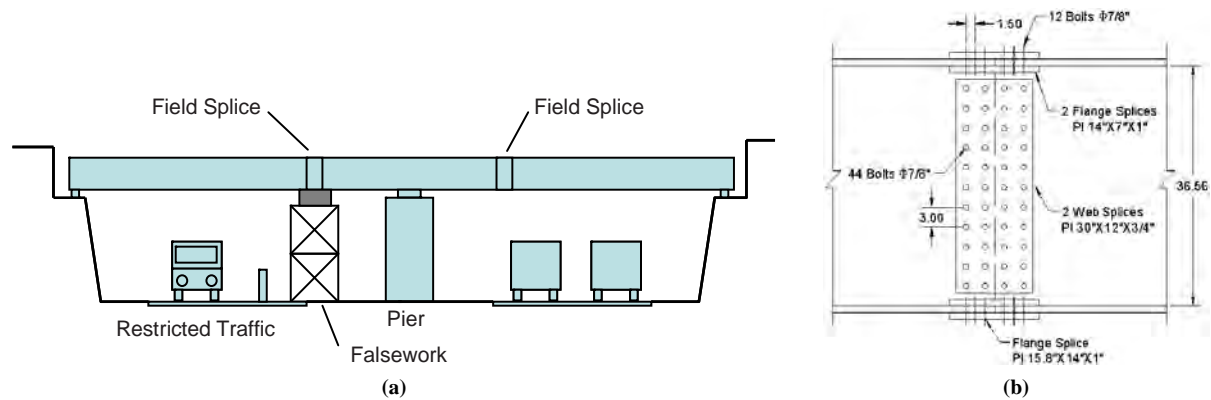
(a) Conventional two-span continuous bridge girder and (b) typical splice detail.
